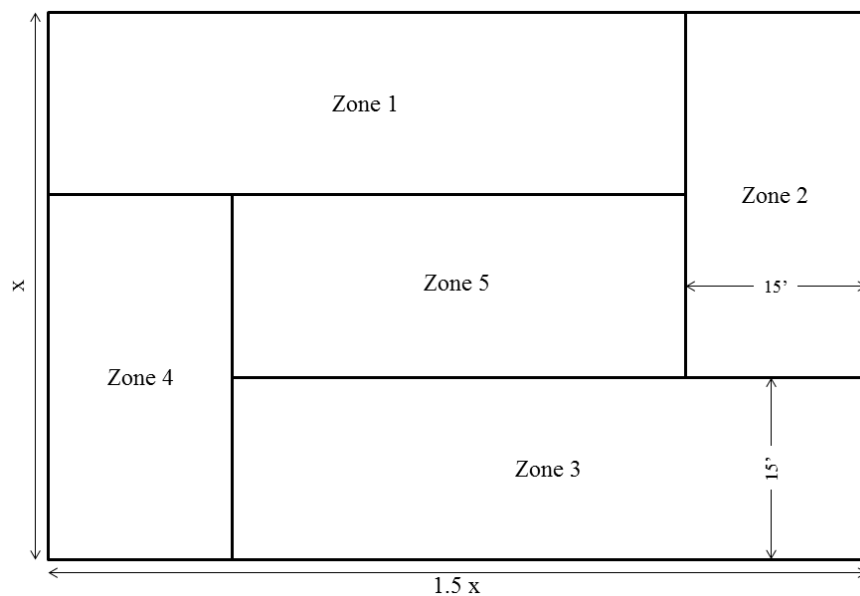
Office zonal floor plan representing 1 of 3 identical floors
